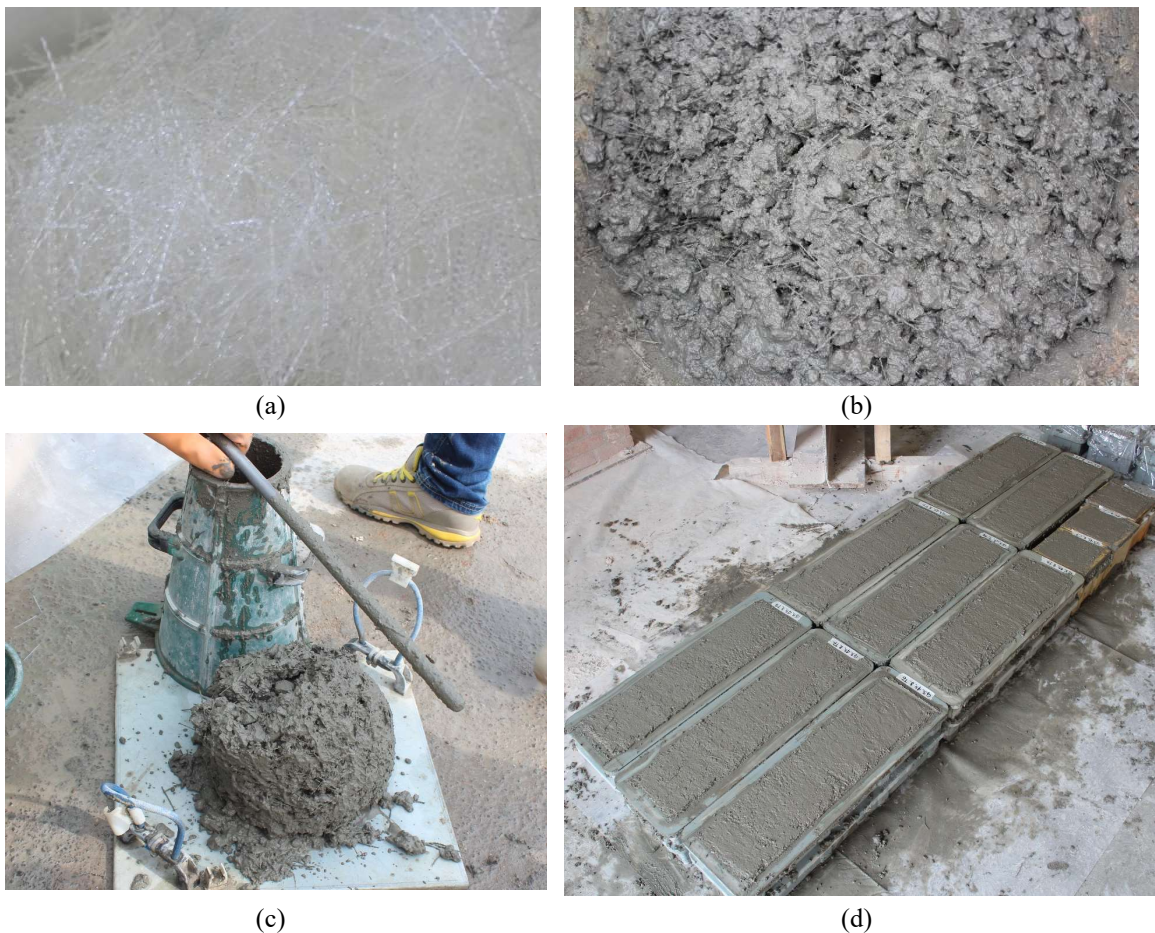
(a) Polypropylene fibers used as reinforcement; (b) Fibre Reinforced concrete mixed; (c) Slump test; (d) Prismatic and cubic specimens.
